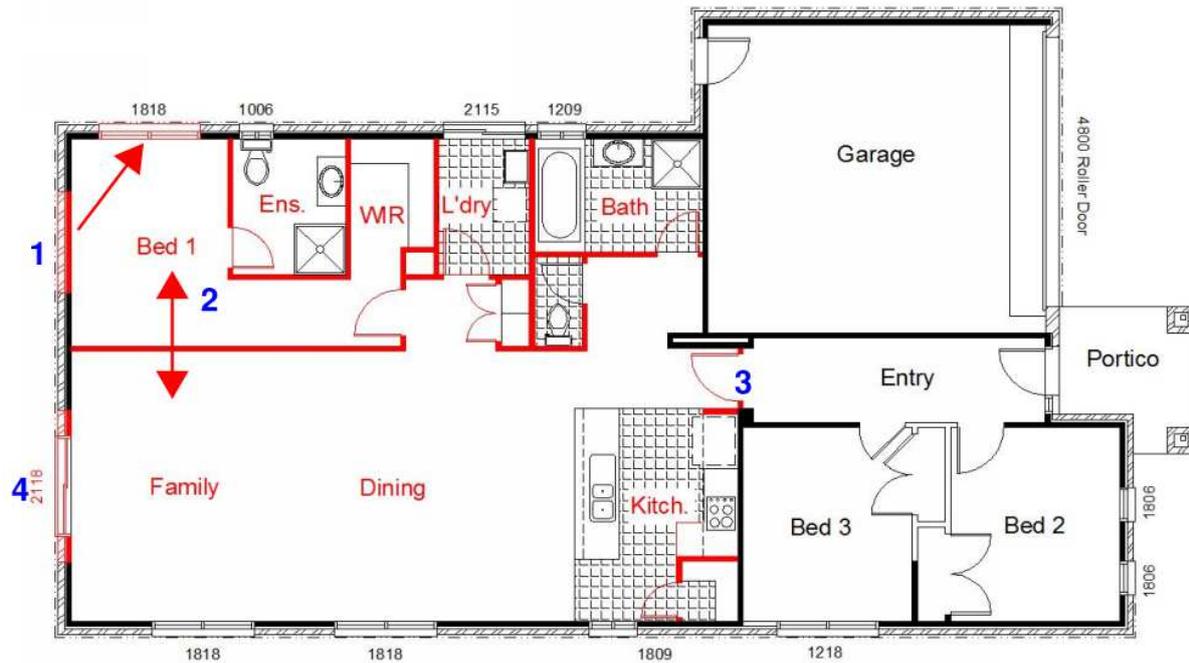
Redesigned floor plan for Dwelling 5 in Darwin.
